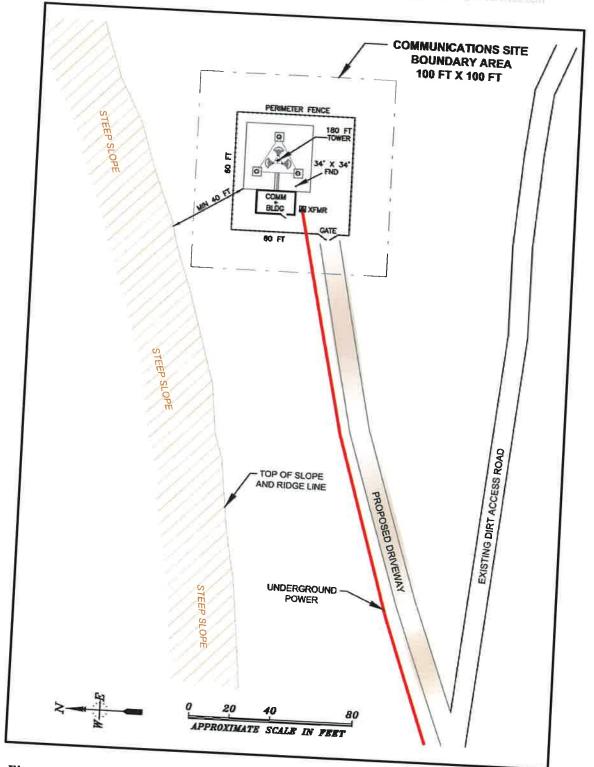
CCEC project plans showing the proposed layout of the communications facility, access driveway, and underground power.
